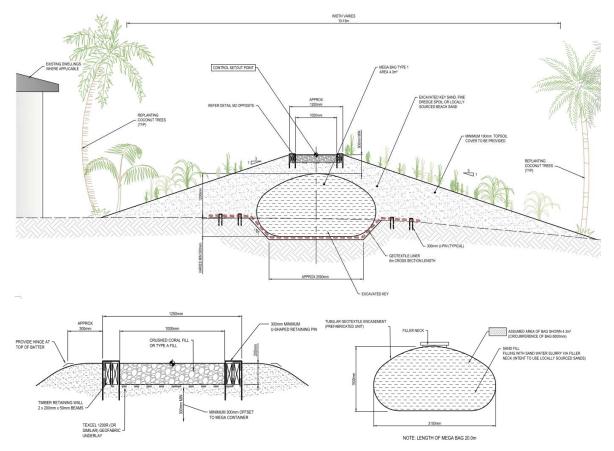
Typical section of Berm Top Barrier (top) and footpath and GMC detail (below)
